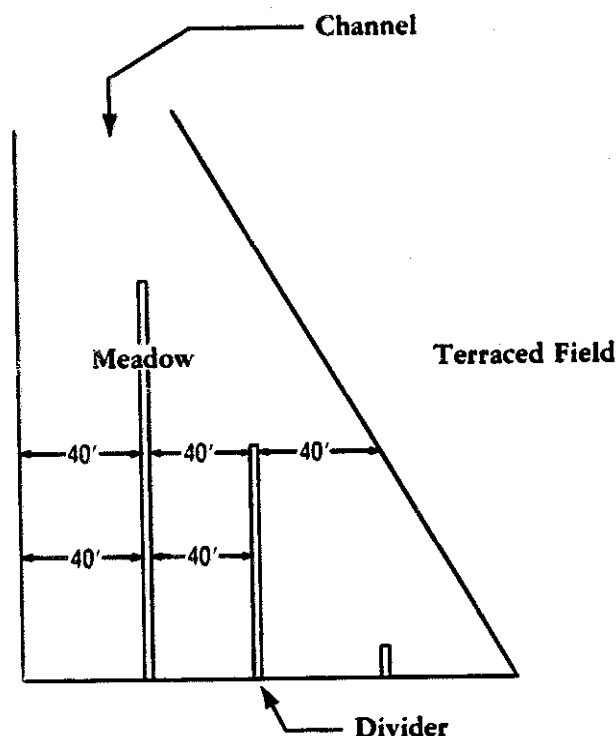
A meadow strip used as an outlet for a terrace. The use of dividers to produce multiple channels is shown.
